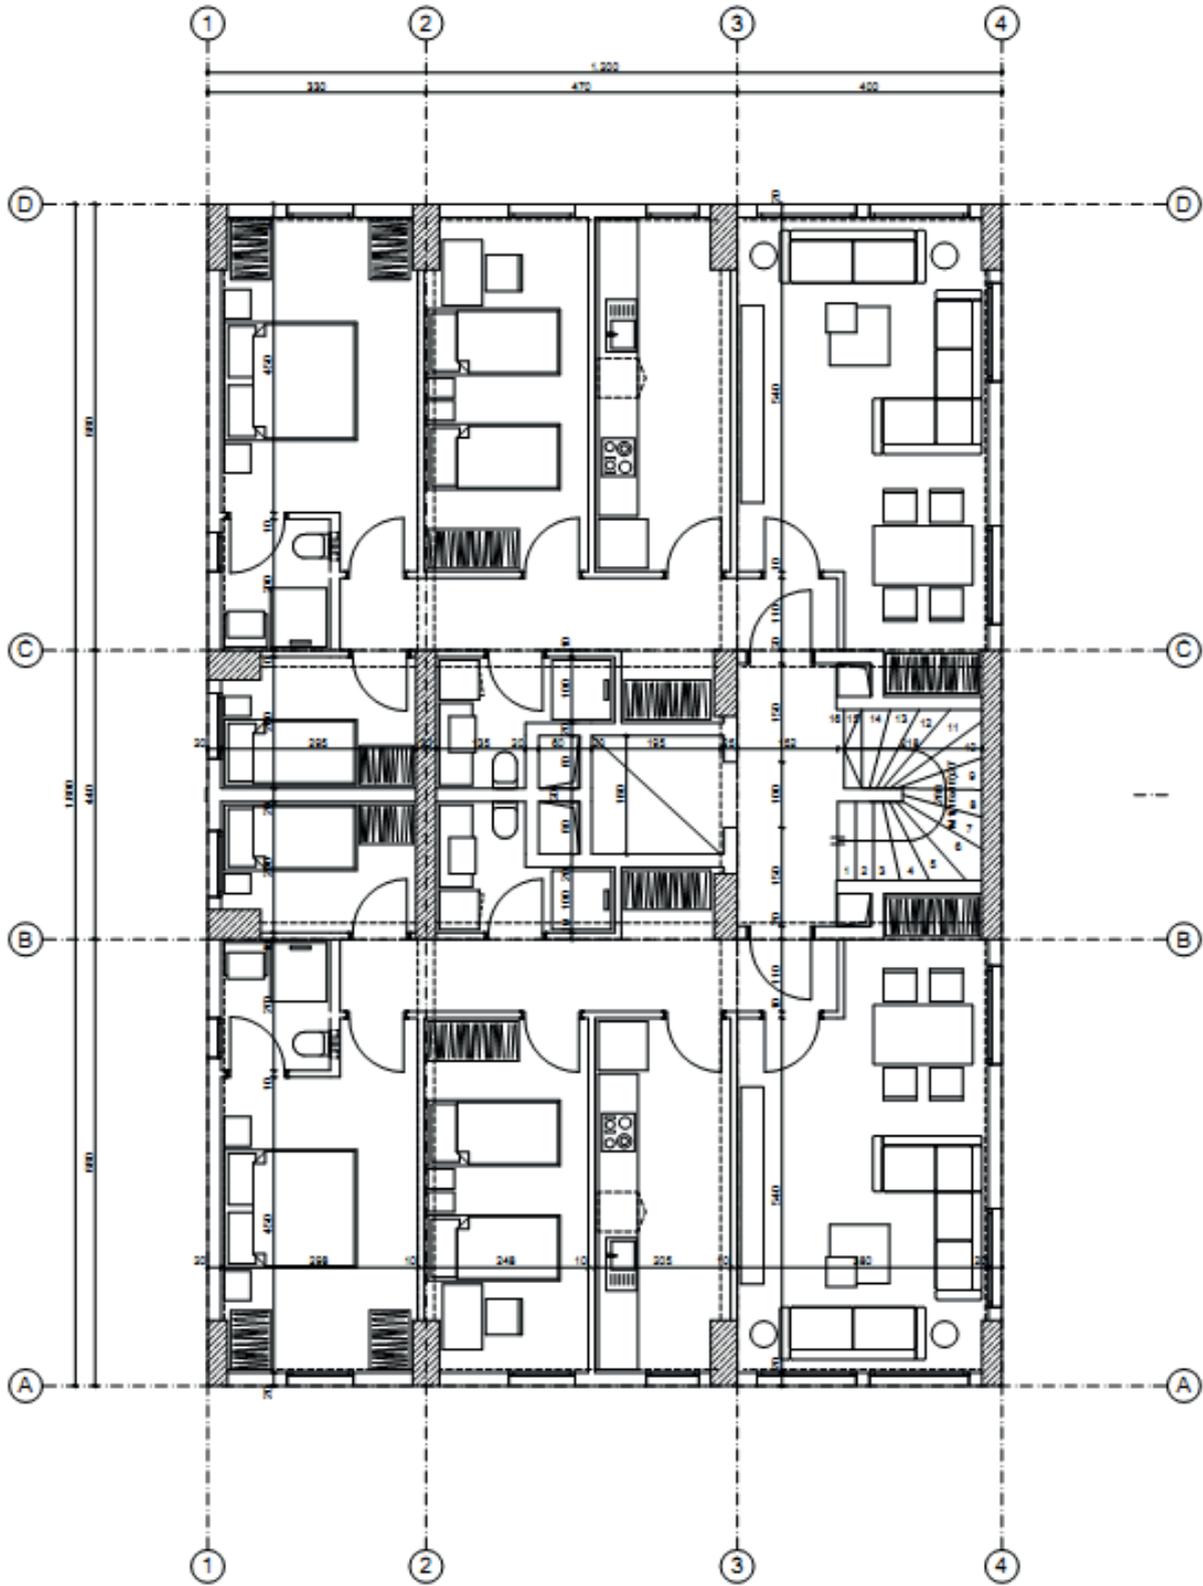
Floor plan of a building with a semi-regular layout (Model 2)
